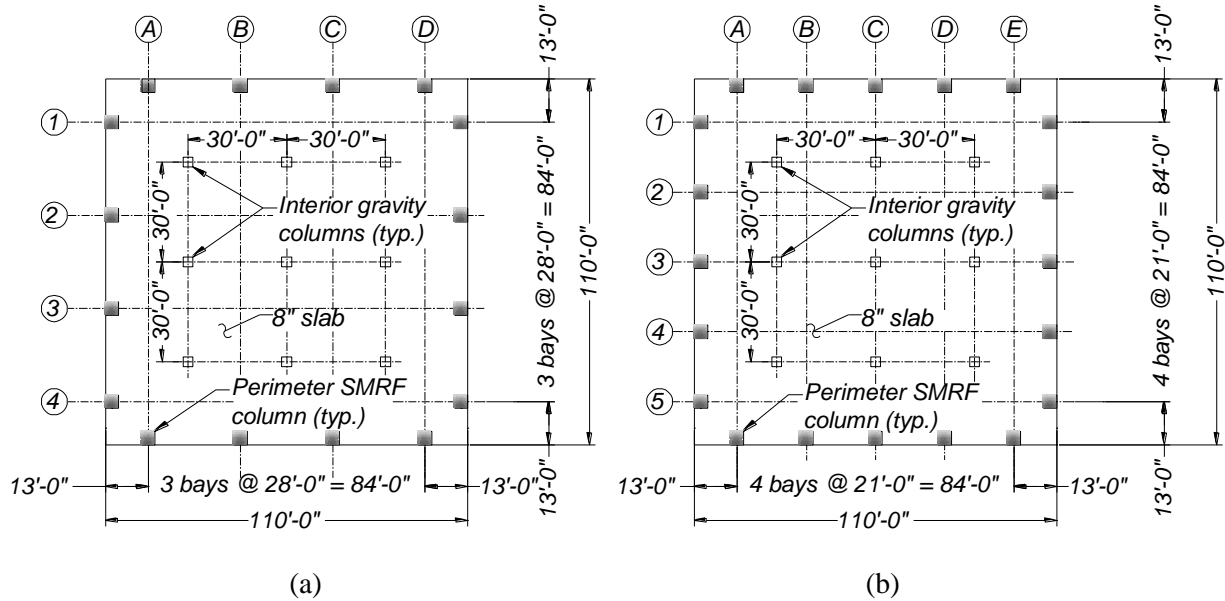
Floor plan of the archetype buildings: (a) 3-bay SMRF configuration and (b) 4-bay SMRF configuration.
